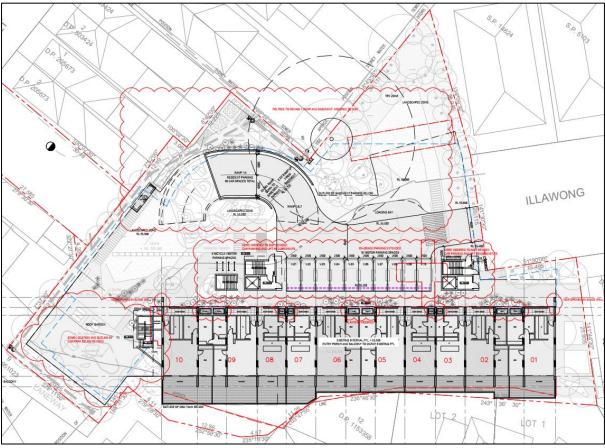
Extract of Approved Ground Floor Plan, DA-125/2012/A – 20 Illawong Avenue, Tamarama Source: Group GSA
